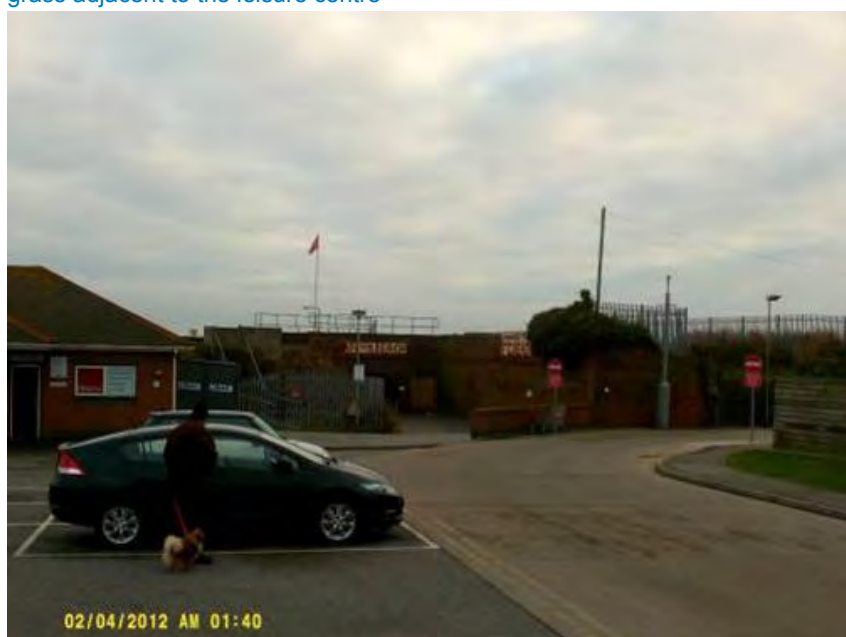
Grassed area adjacent to existing leisure centre looking towards under-bridge no. 214
